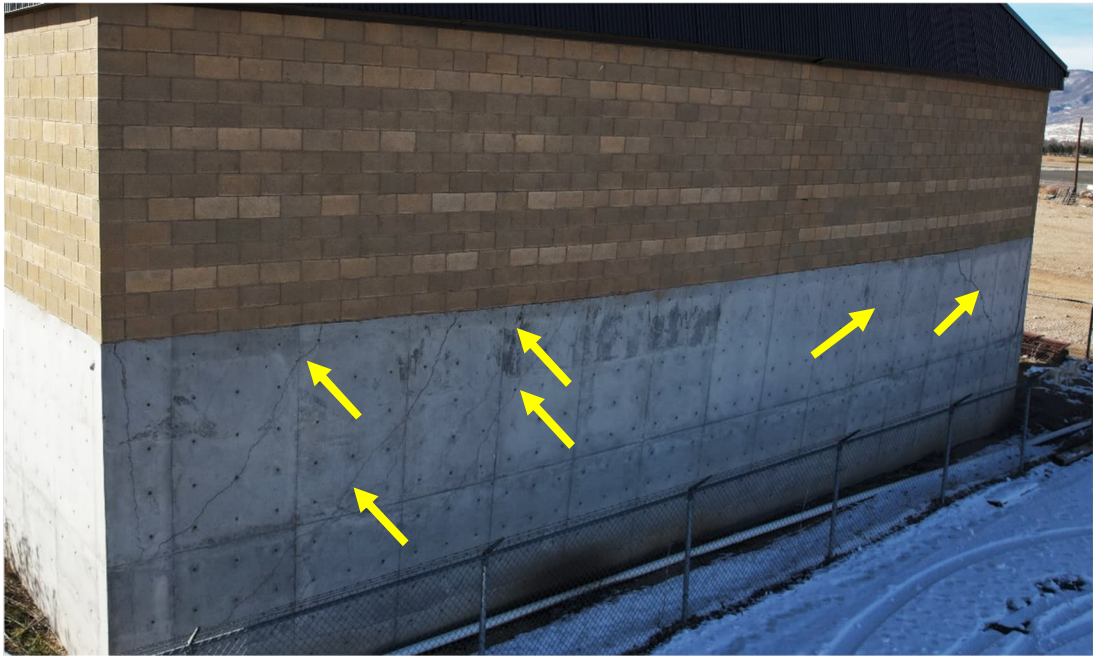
Outward bow of north wall; diagonal fractures in concrete at north wall.
